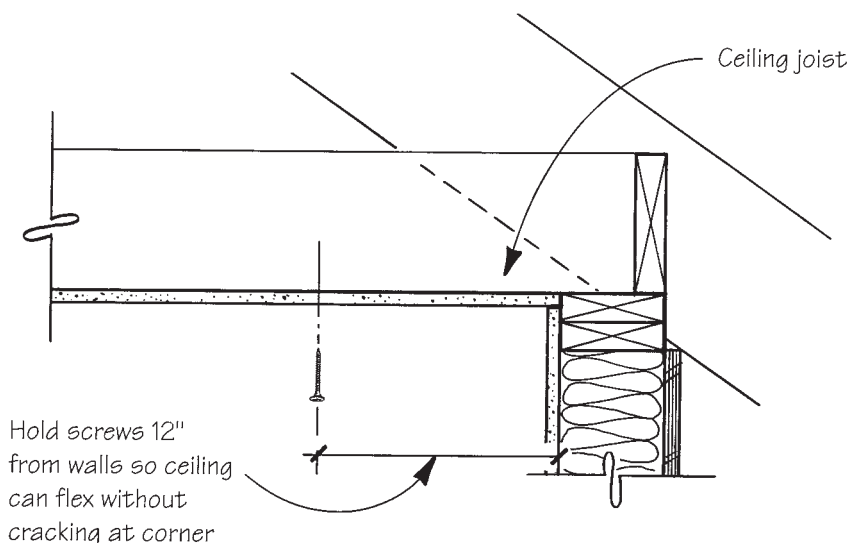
Holding ceiling fasteners 12 inches back from the edges creates a “floating” corner, which is much more forgiving of framing or truss movement. The ceiling board must be installed first, and the supporting wall board pushed tight to the ceiling.
